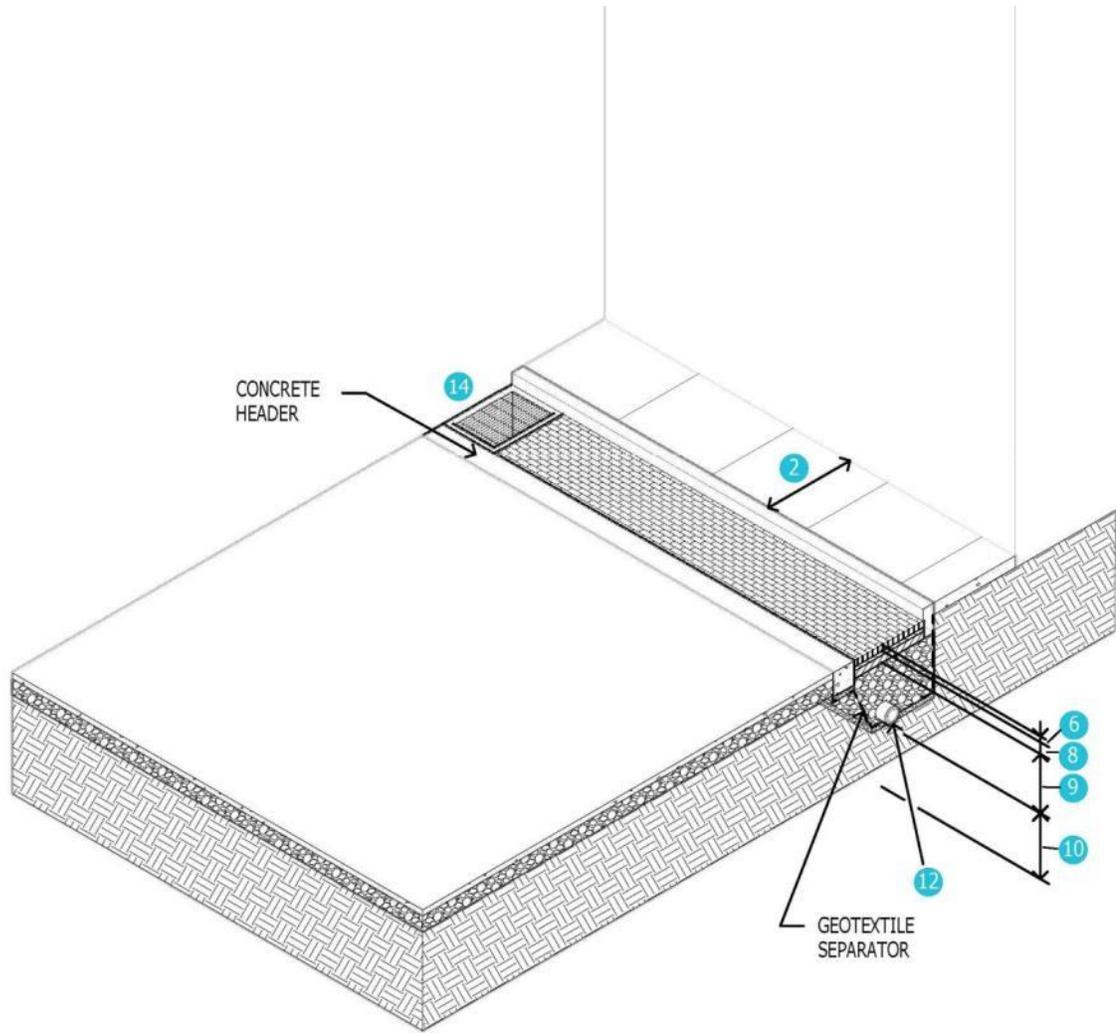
PERMEABLE PAVEMENT DIAGRAM
